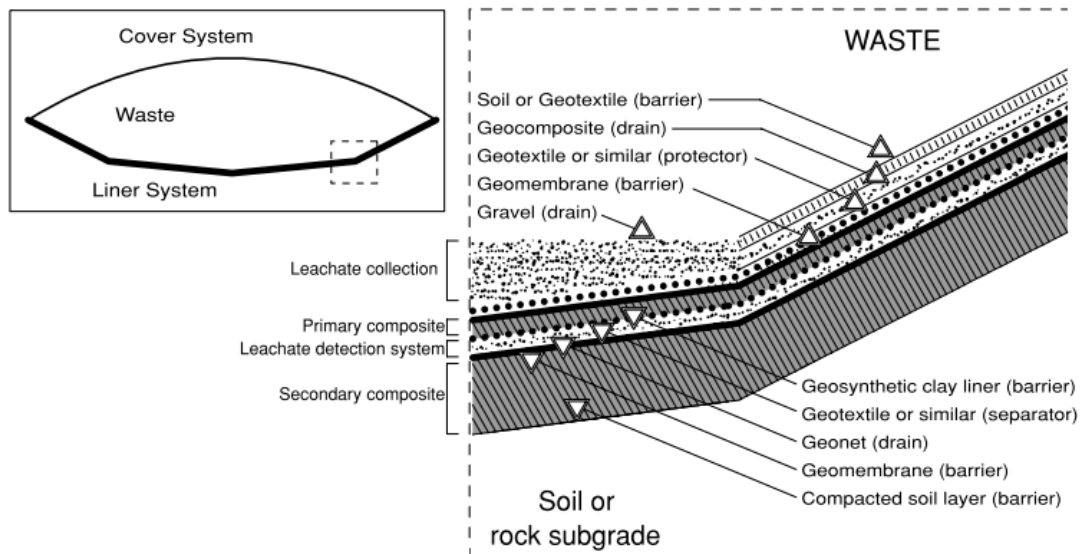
Lining system of an engineered MSW landfill (after De Brito Galvão et al., 2008)
